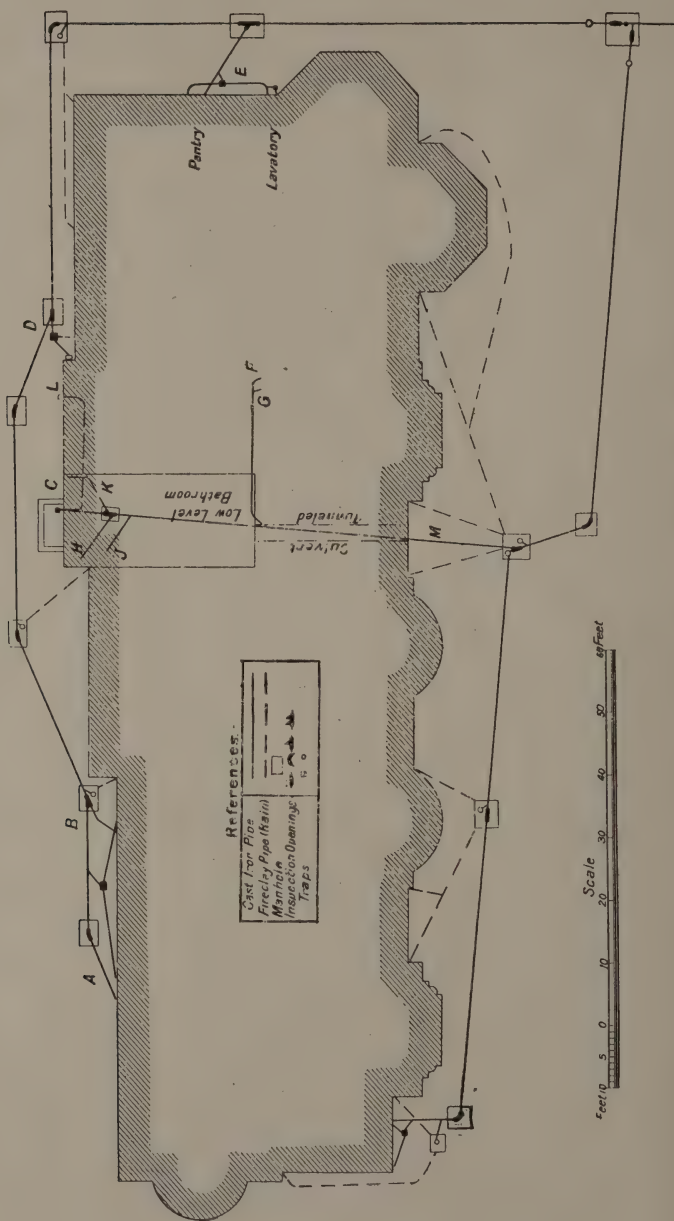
Drain Plan, showing Re-constructed Drainage.
